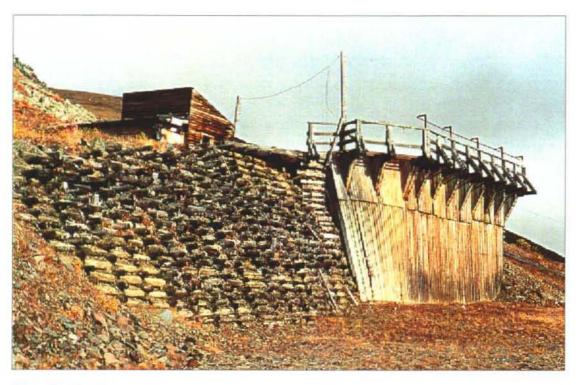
Comstock-Keno 150. Adit shack & truck-loading trestle.
